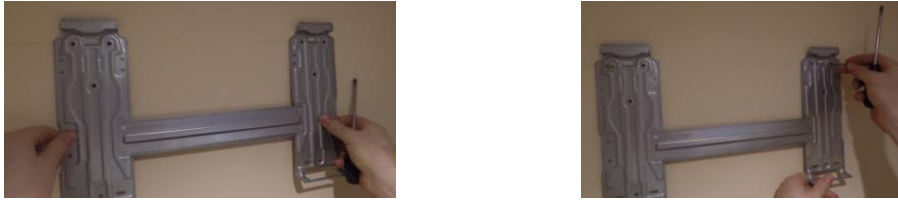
(a) Place the mounting plates (b) Placing the screw
